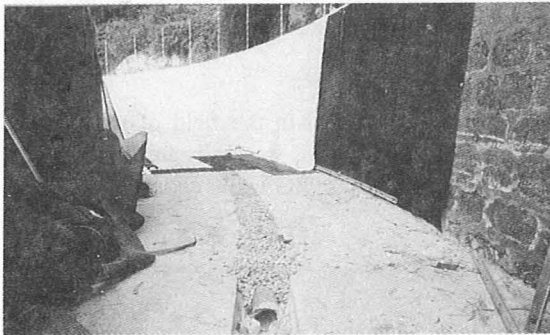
Longitudinal drainage pipe at the invert, HDPE drainage geonet, flexible PVC liner
